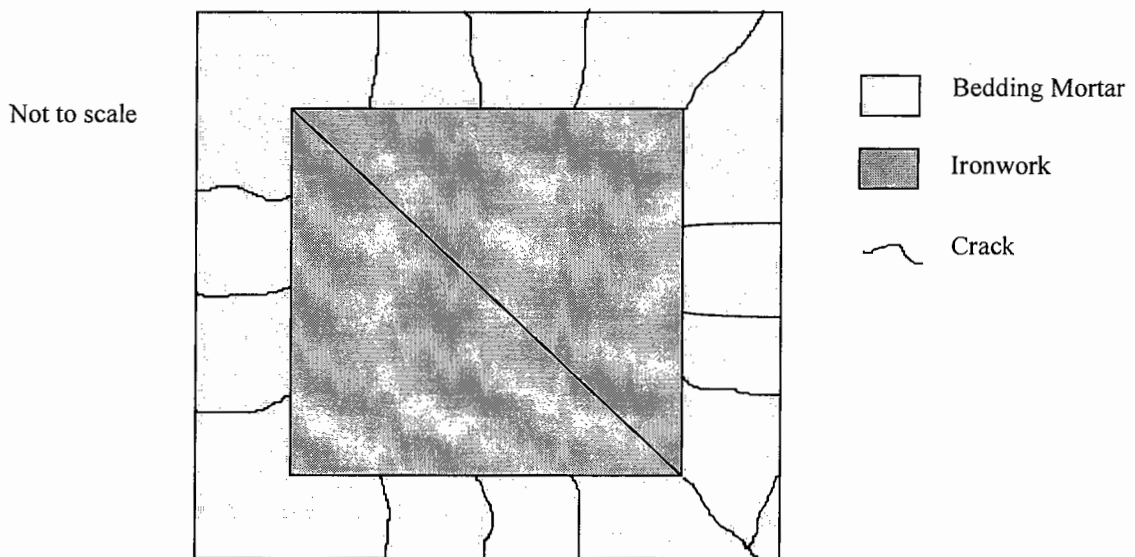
Plan view of typical crack pattern that developed in all mortar A samples
